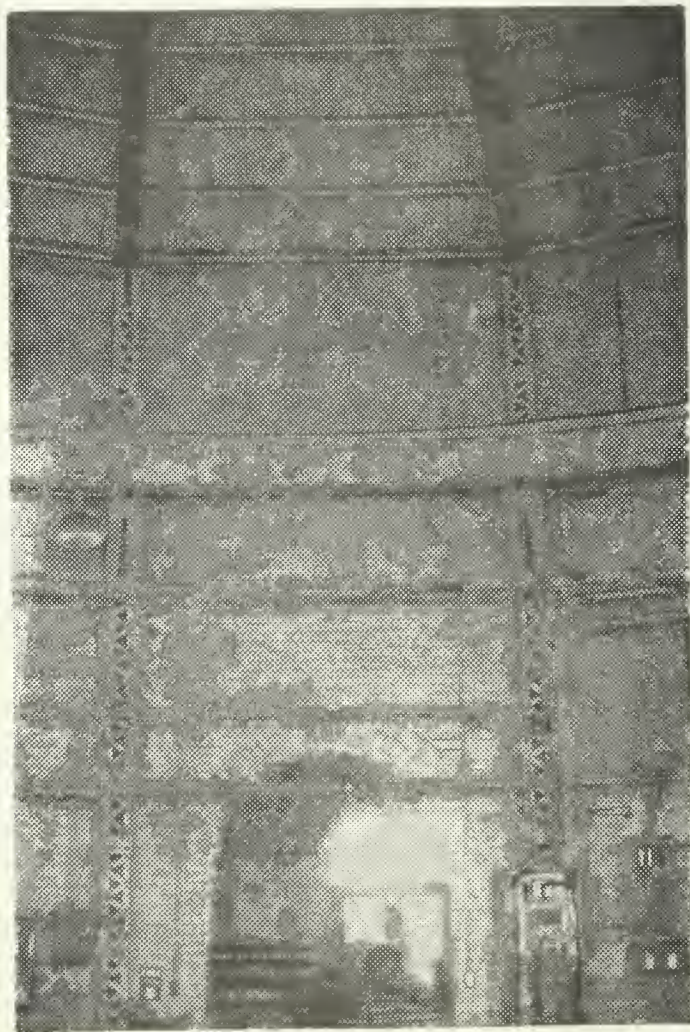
B. East St. Louis Waterworks, Ceiling and Wall Braces, 1980.
